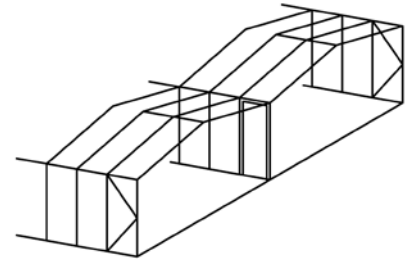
Vertical bracing in walls + portals in the plane of the valleys (plan bracing omitted for clarity).
